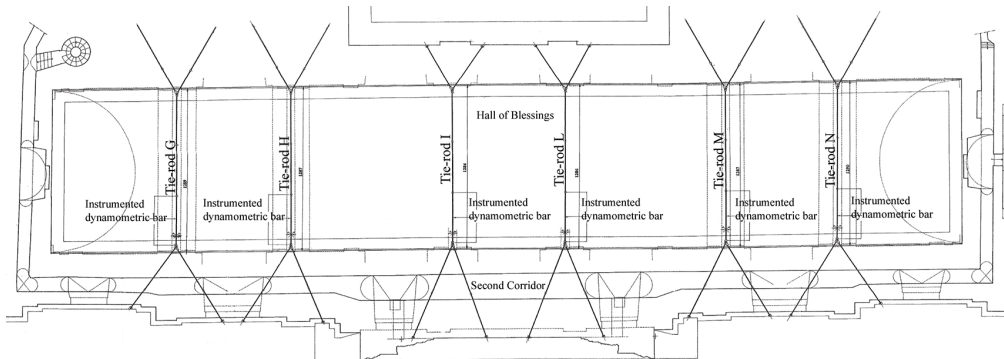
Cross-section B-B: floor level of the Hall of Blessings showing the system of structural tie-rods (location indicated in Figure IV.14).
